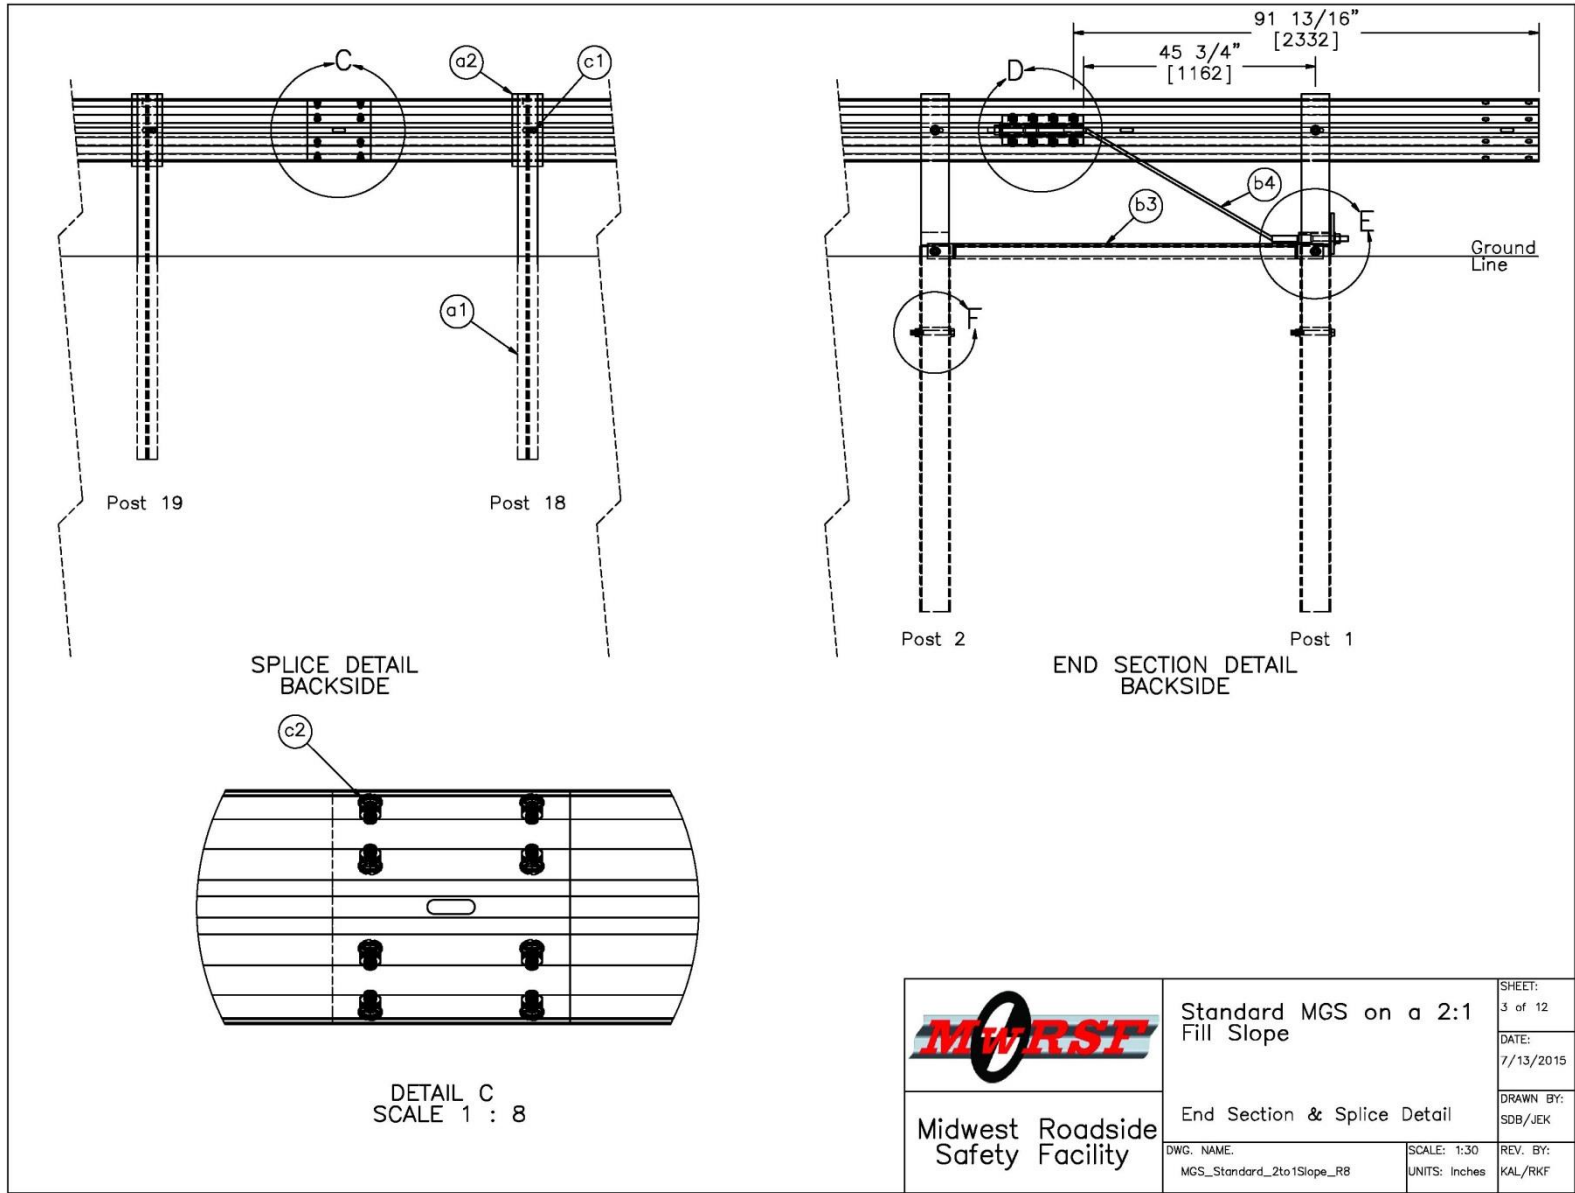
End Section and Splice Detail, Test No. MGSS-1
